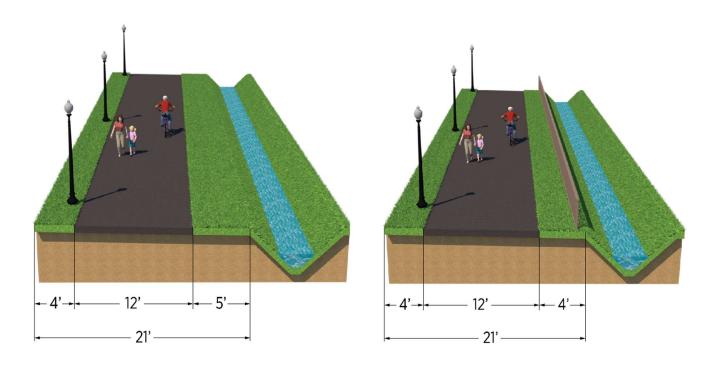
Typical Section for Independent Trail Facility Adjacent to Canal (without & with railing)
